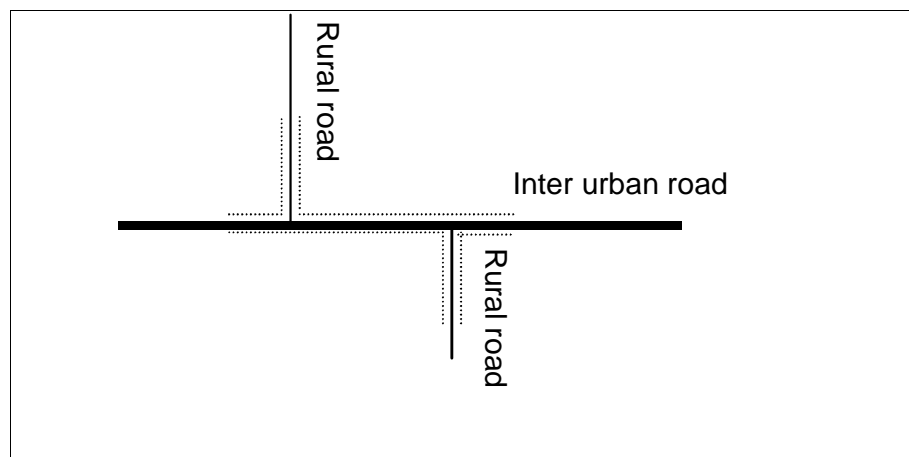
Basic layout of a crossroad in an inter-urban road.
